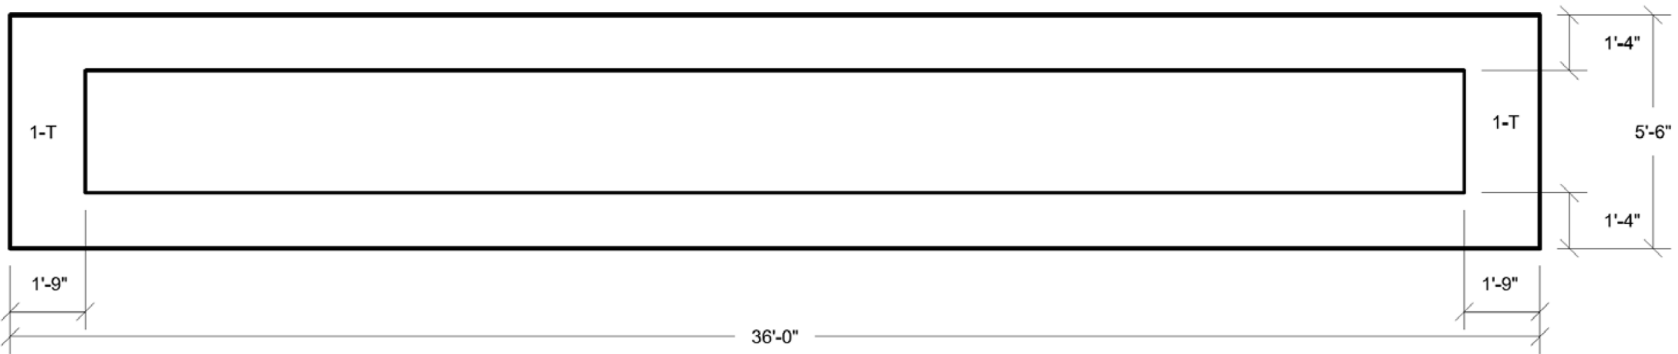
H.7-19A Roof of Tunnel Looking Down Transverse Reinforcement Zones
